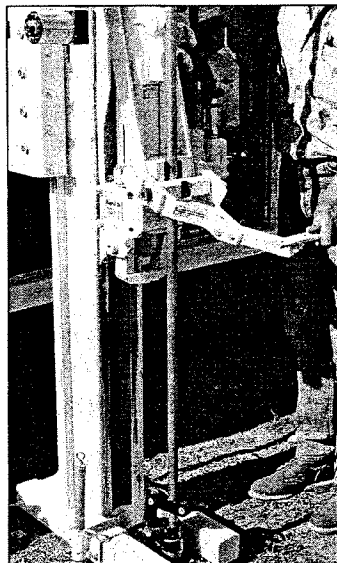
Raise the inner rod string using the probe hammer and a Rod Grip Pull Sytem if rods are too heavy to lift by hand.
